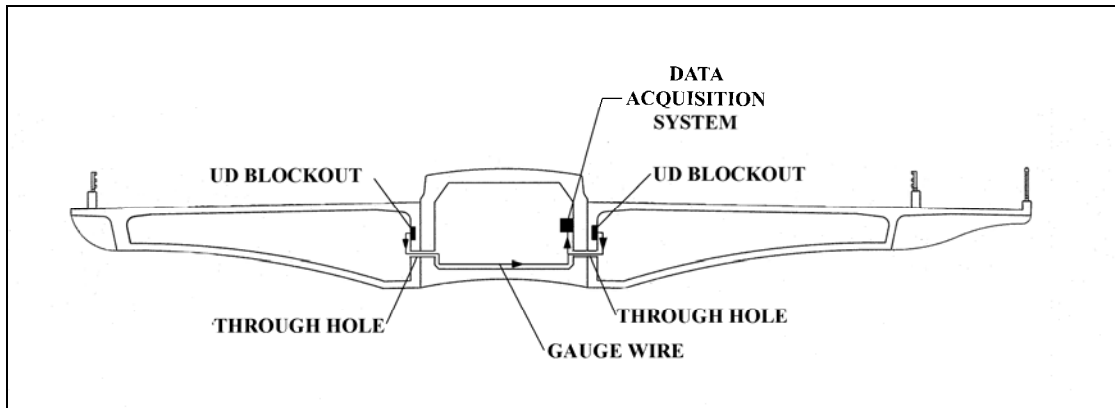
Gauge Wire Routing Schematic (elevation view) (Modified IRIB Specifications and Construction Plans)
